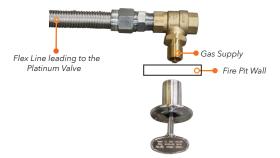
Connecting the Flex Line from the Platinum or Cobalt Valve to the Key Valve
